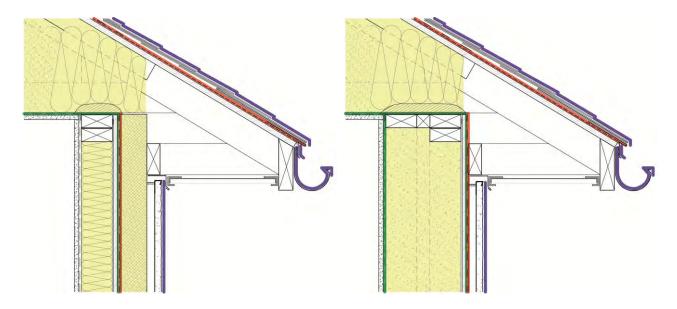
Detail 8-SI – Location of Critical Barriers
